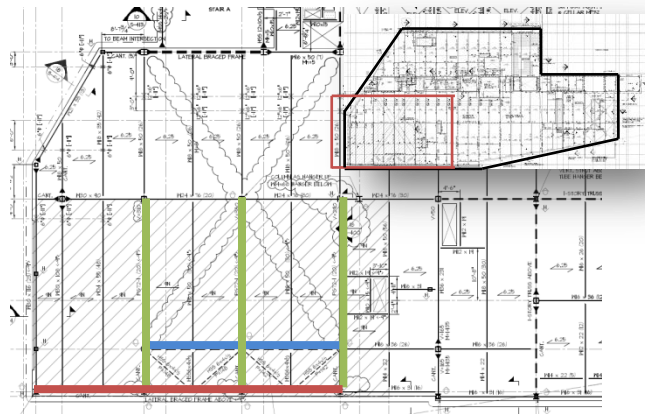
Level 3 framing plan showing transfer girders and lateral braced frames (S-103)
